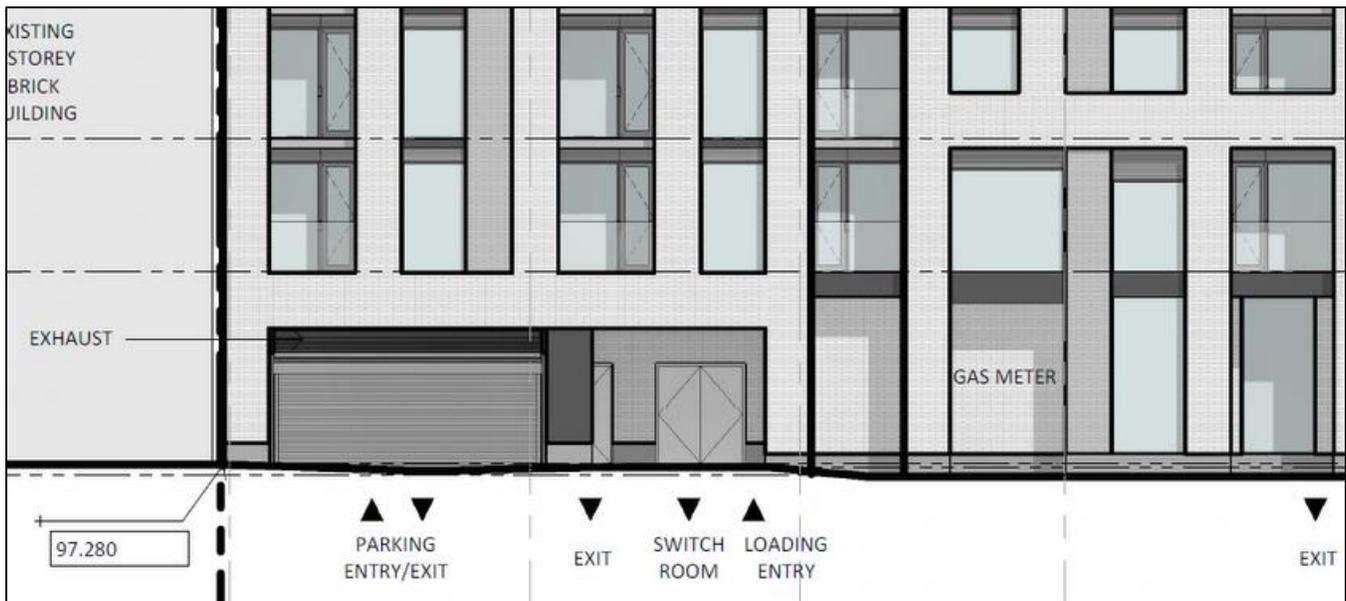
East Elevation Drawing – Loading door along Bowen Street
